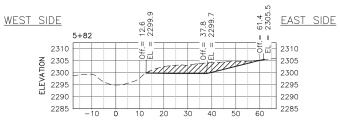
DETAILED GRADING PLAN DOWNSTREAM RIFFLE
